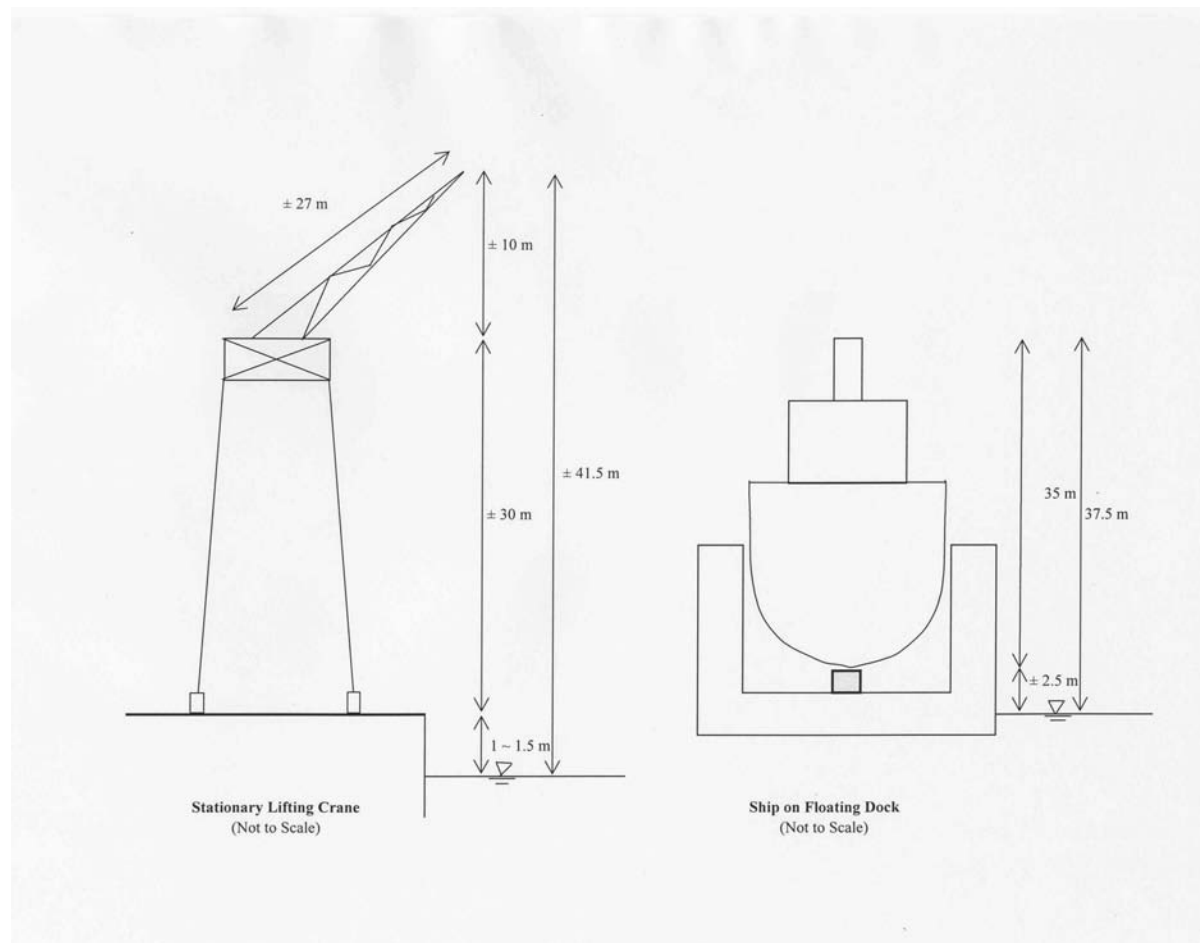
The Height Obstruction of Dockyard Facilities
